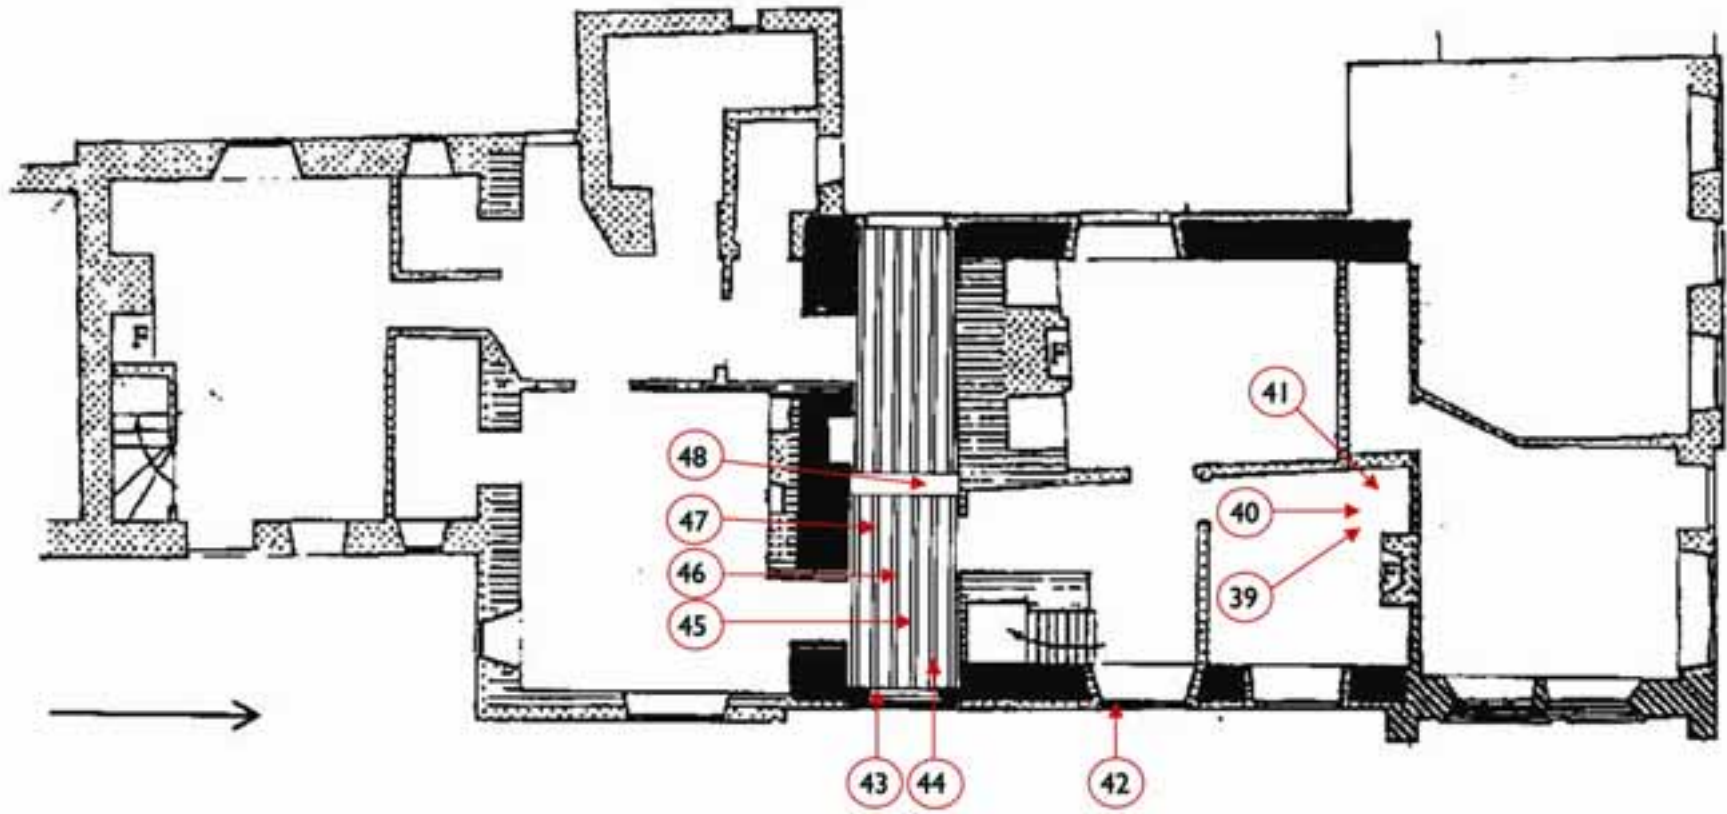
Ground floor plan showing sample locations (based on a drawing by M W Barley 1975)
